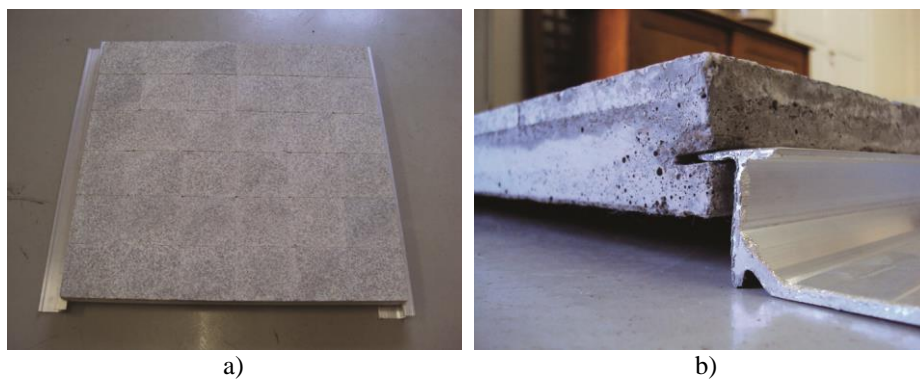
The manufactured façade panel: a) the pilot element with placed carrier rails Tabáš, b) a detail
